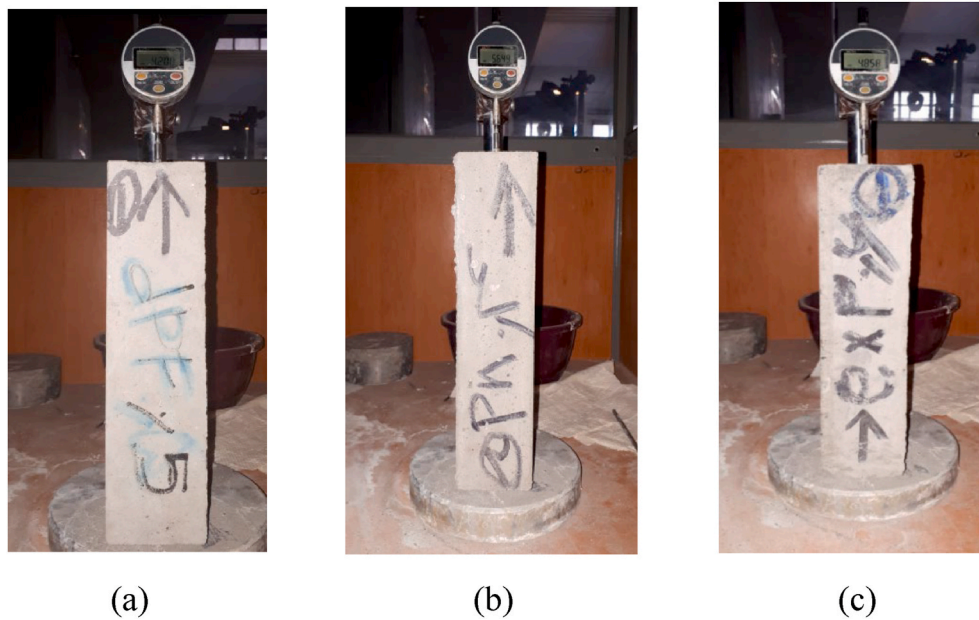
Drying shrinkage test on all specimens of each mix design: (a) DPM-0.5 specimen, (b) Plain-0.4 specimen and (c) EXP-0.6 specimen.
